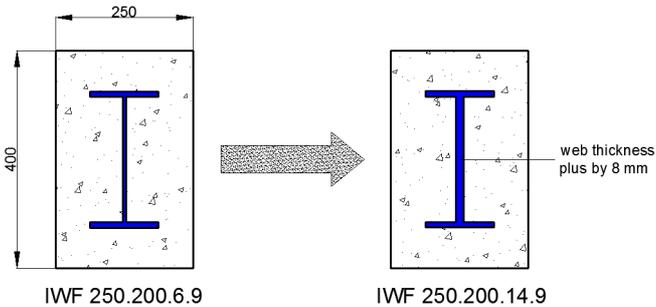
The detail of adding the 8 mm of IWF web thickness (beam 4.25 m)
